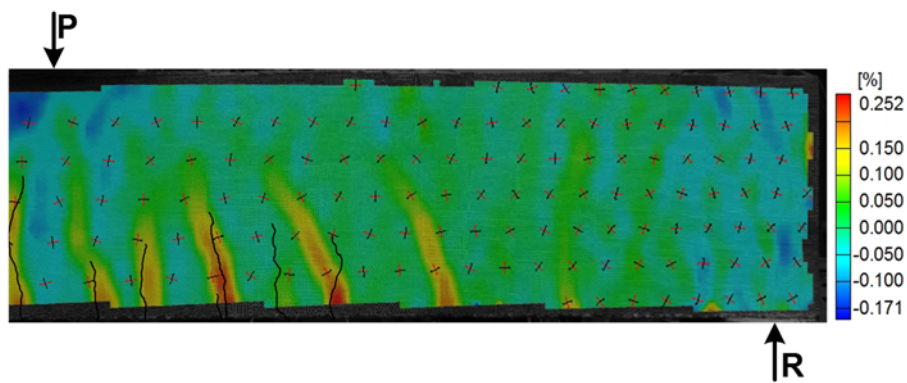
Full-field concrete longitudinal strain ( $\epsilon_x$ ) across shear span for specimen RC18b at load 30 kips
